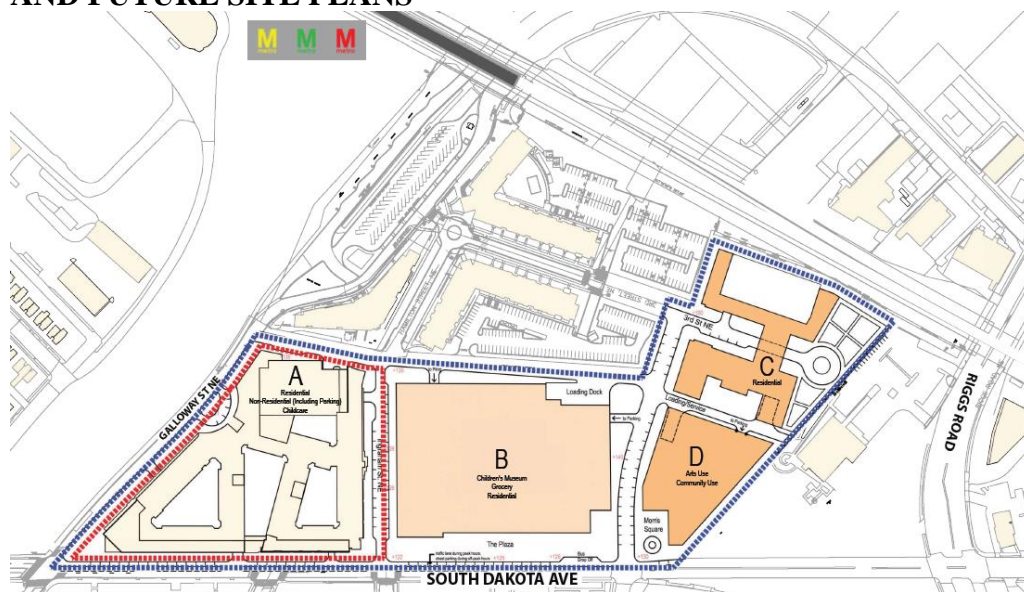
Previously Approved Site Plan with Constructed Consolidated PUD Building A to Left and Approved 1<sup>st</sup> Stage PUD Building B in Center
